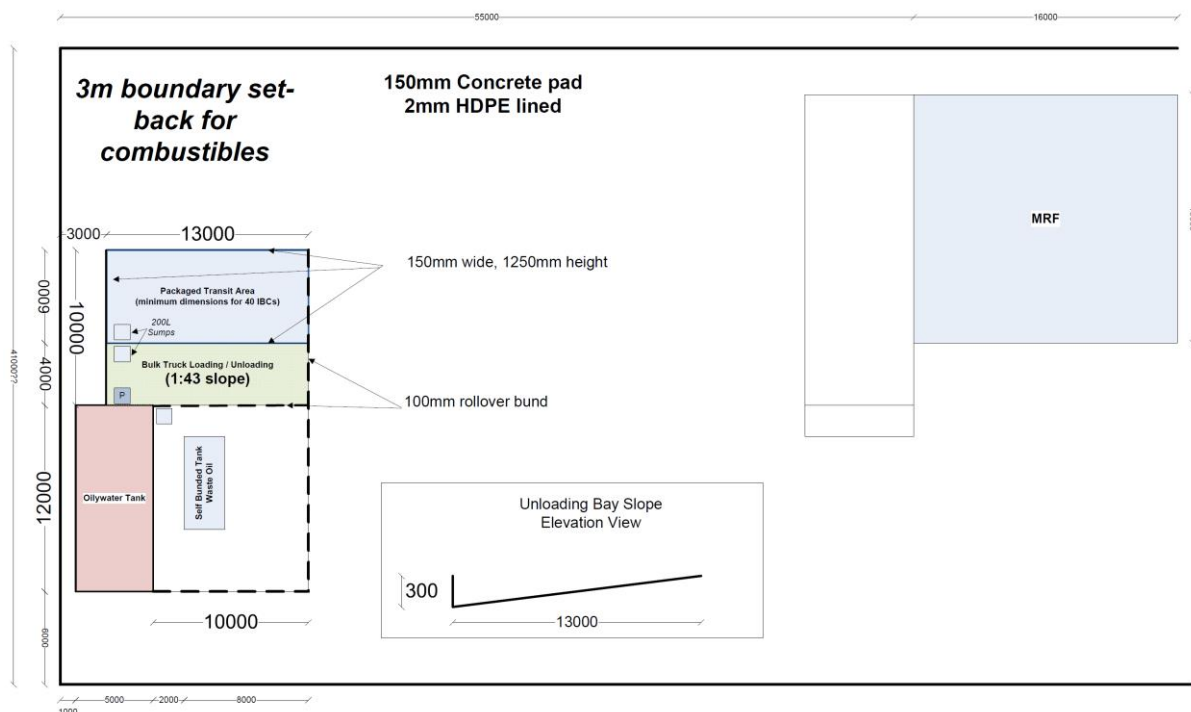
Layout design of the Tox Free Broome liquid waste storage area.
